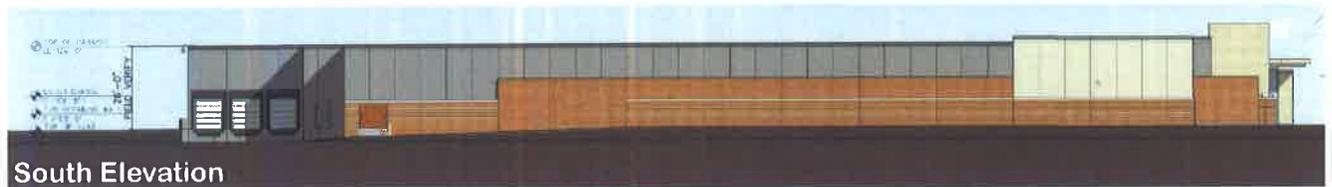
EXHIBIT A: CONCEPT ELEVATIONS (ENLARGED)
